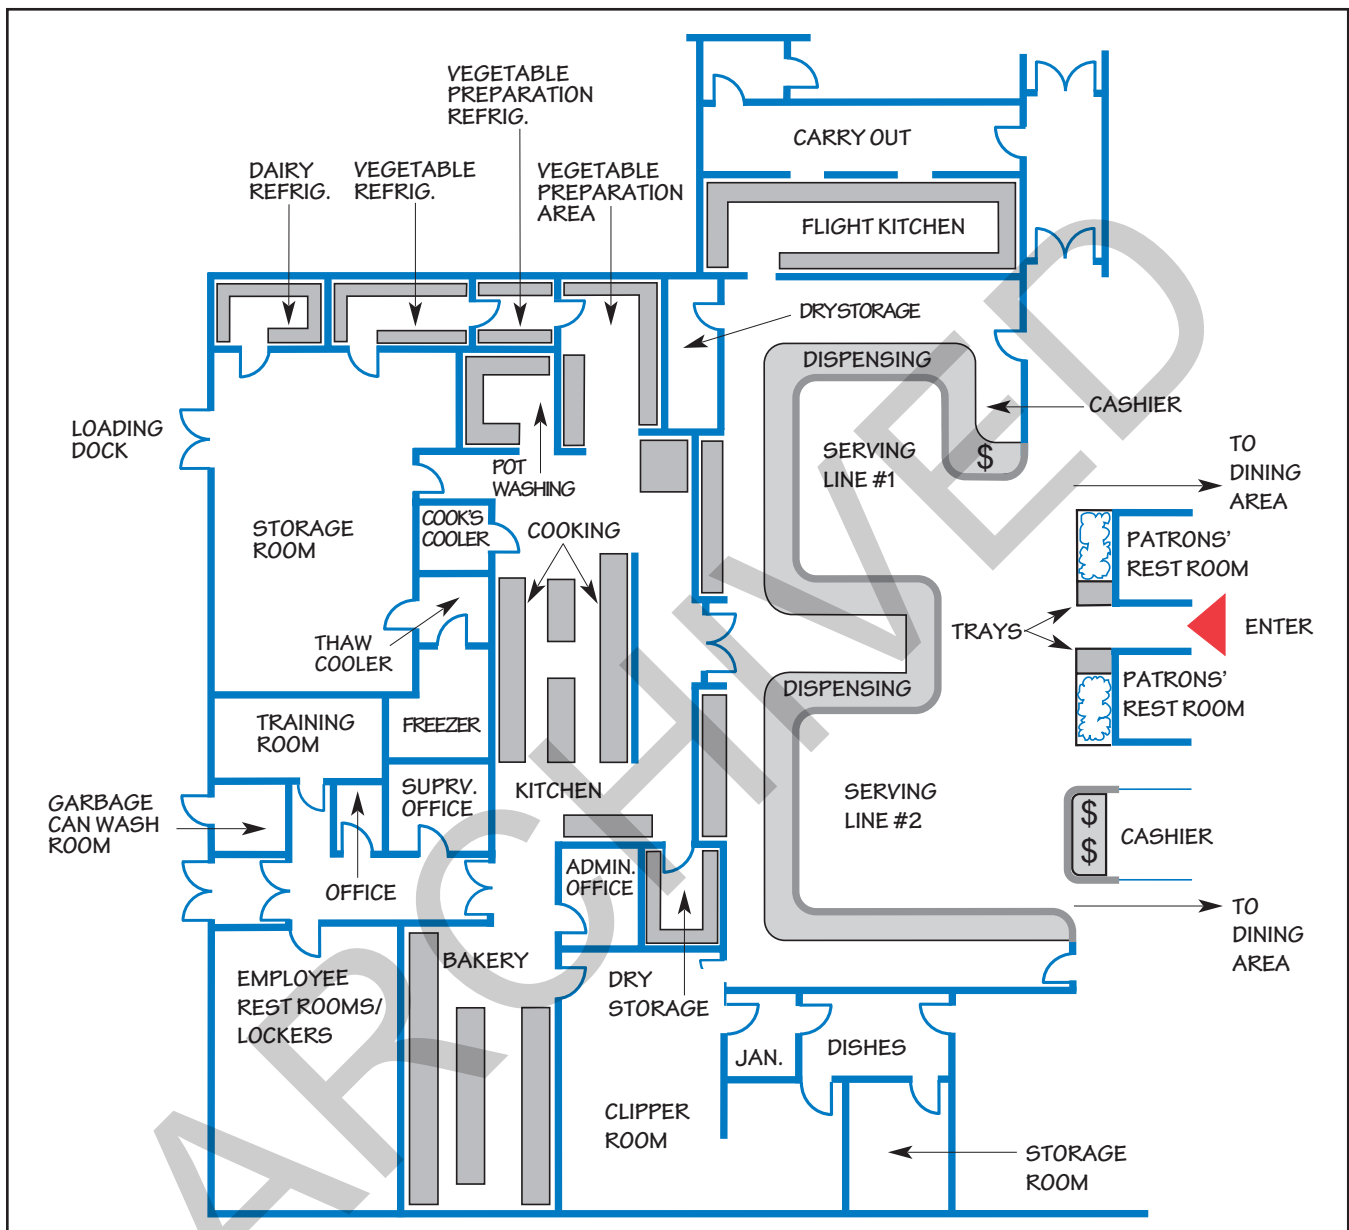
B: Concept Floor Plan for the Dining Facility Kitchen.
